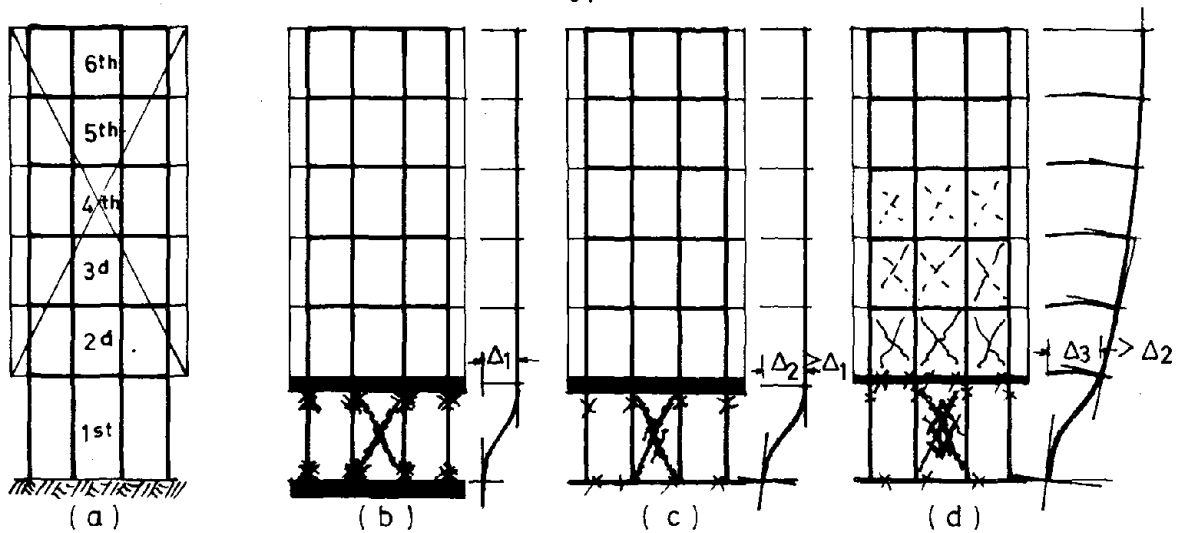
Typical deformation damage pattern of structures with flexible reinforced concrete frame, masonry infill panels, and an open first story: (a) elevation view; (b) strong top and bottom beams, with extended damages in the first story only; (c) strong top and weak bottom beams, with more damage in nonstructural elements and concrete walls, less damage in top parts of the columns of the first story only, and damage in the foundation; and (d) weak top and bottom beams, with more damage in nonstructural elements and concrete walls than in case (c), less damage in columns than in case (c), and extension of damage in upper stories.
